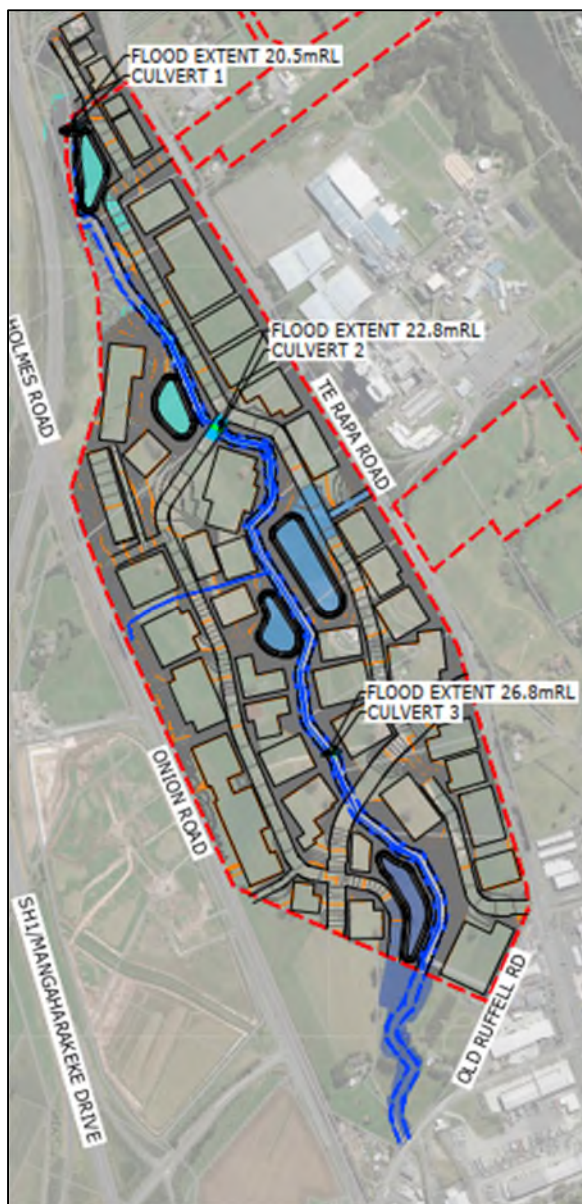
West Block - Conceptual Te Rapa Stream Flood Storage Zones.
